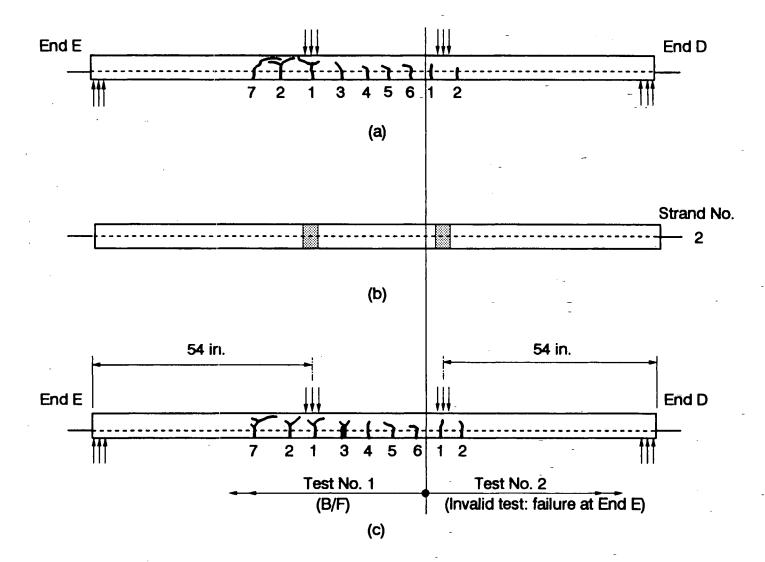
Crack patterns for D-type Specimen No. 10-6.0DU-10: (a) mirrored side view along Strand No. 2; (b) top view; (c) side view along Strand No. 2
